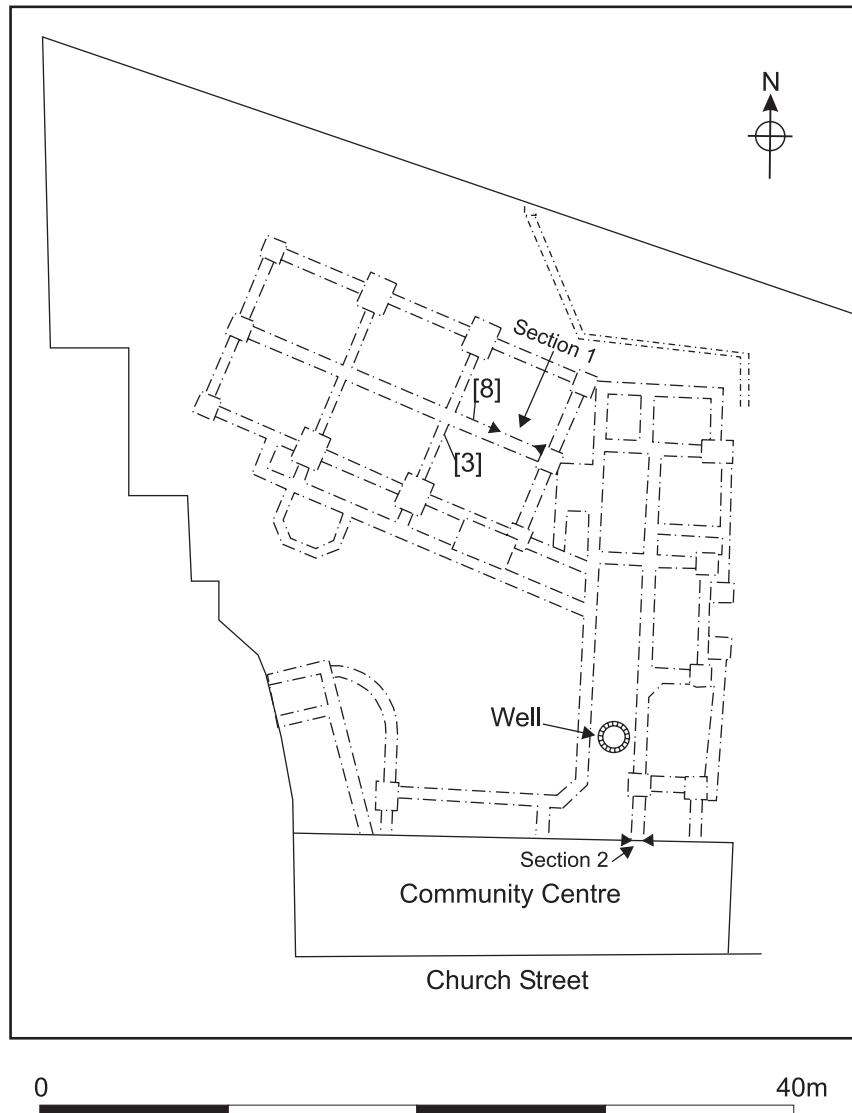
Plan of footing trenches with location of features [8] and [3], the well and Sections 1 and 2. Scale 1:400
